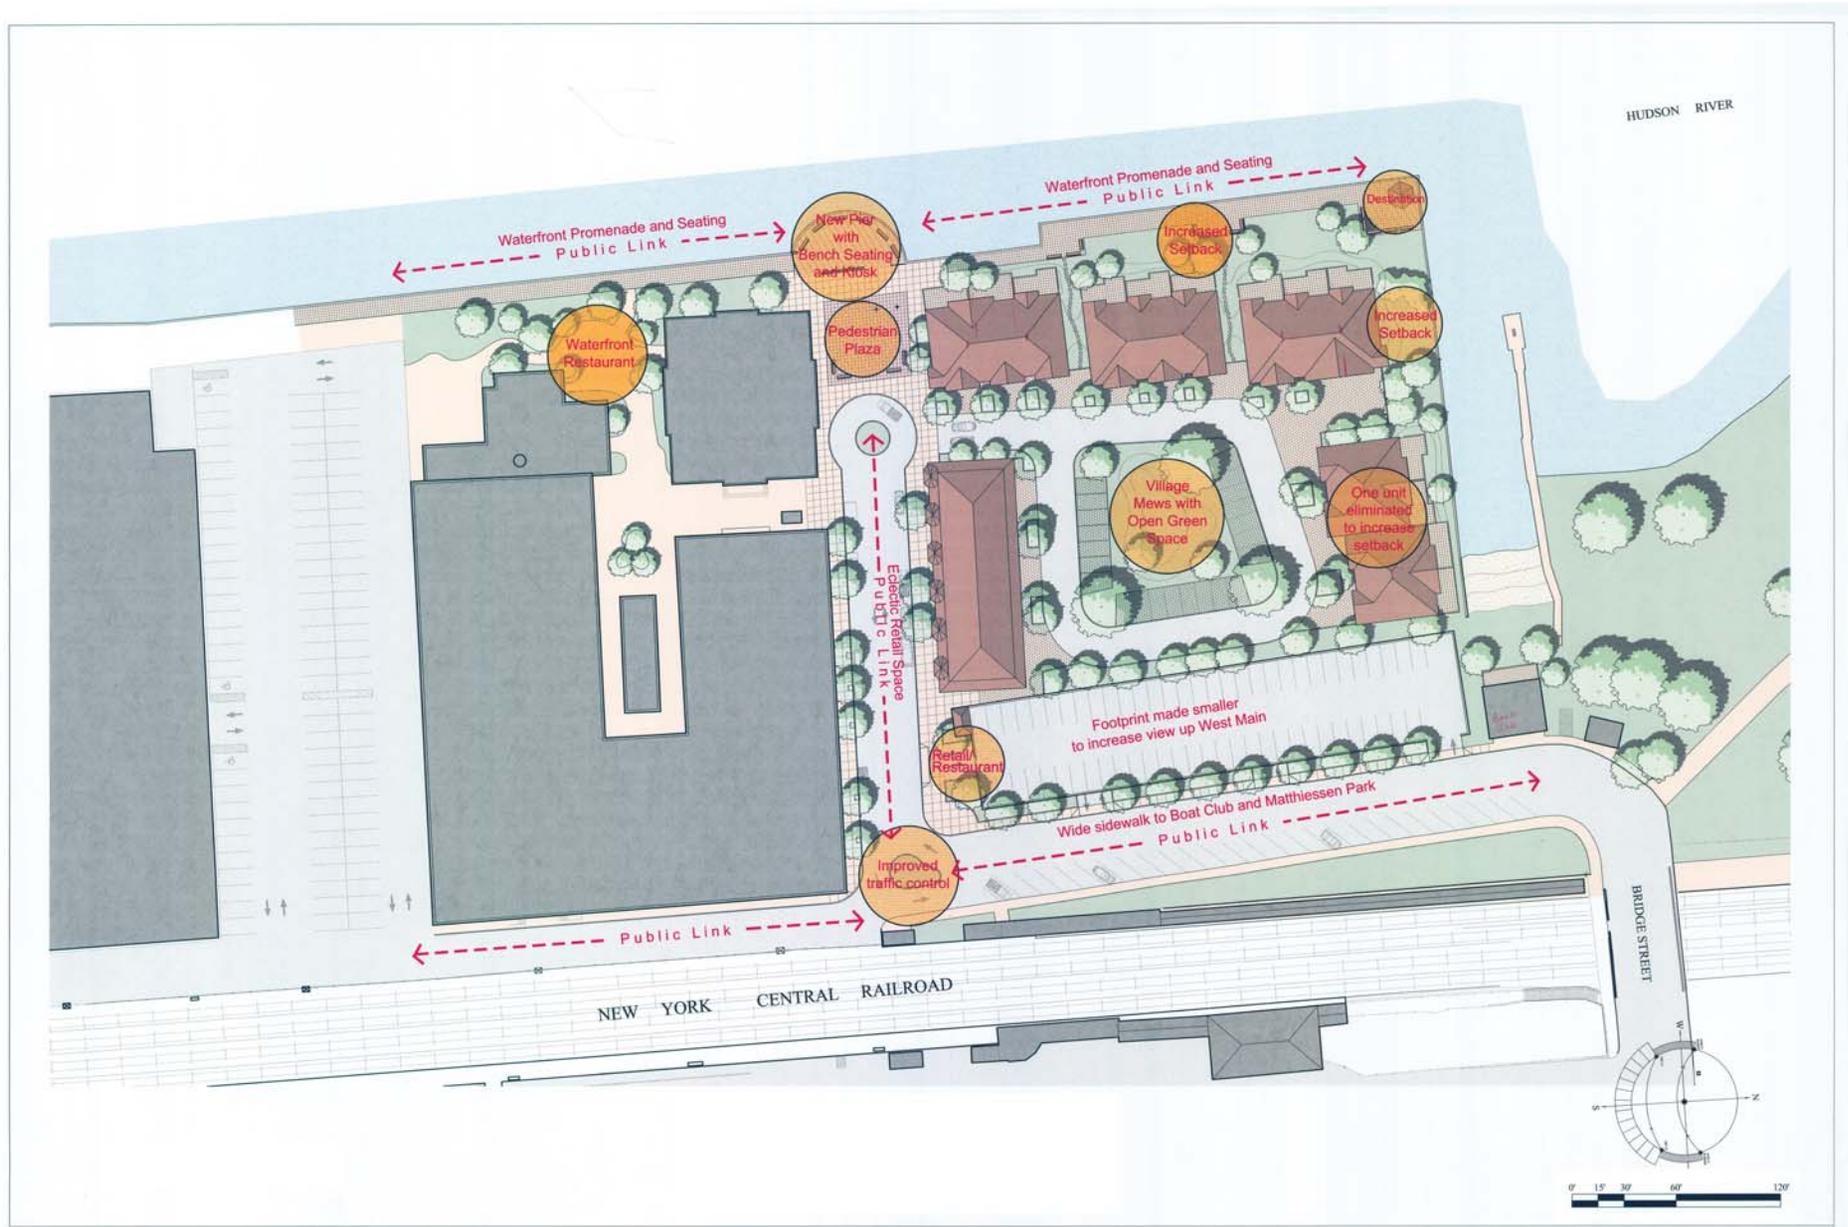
BRIDGE STREET PROPERTIES PROPOSAL
